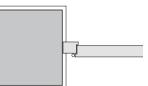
Rebated jamb (internal door) no rebate in door leaf
